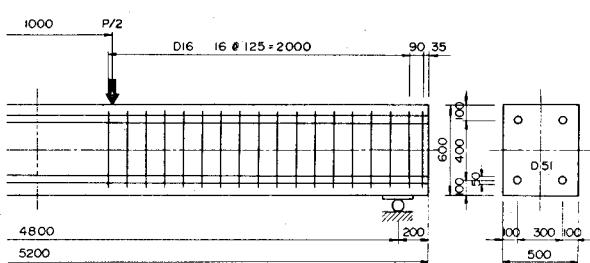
Dimensions of R.C. Beam with Large Size Deformed Bar
